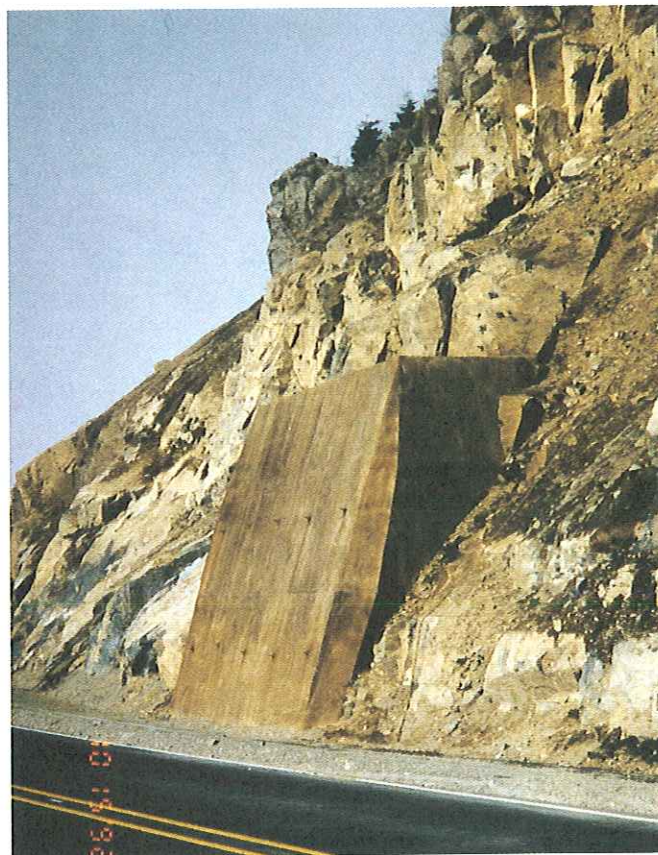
Concrete buttress completed at the toe of the slope. The buttress was tied to the rock with dowels and rock bolts (*Courtesy Washington Department of Transportation*).
